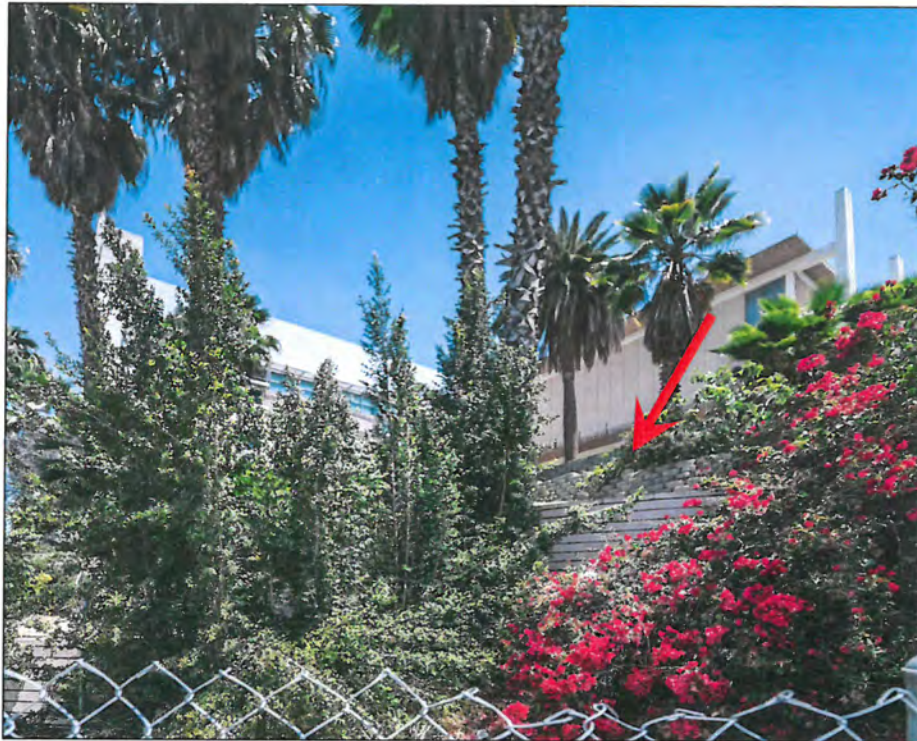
Administration building west elevation (right) and Sanctuary south elevation (left), view northeast, note addition of new retaining walls (New Plus, 2016)
